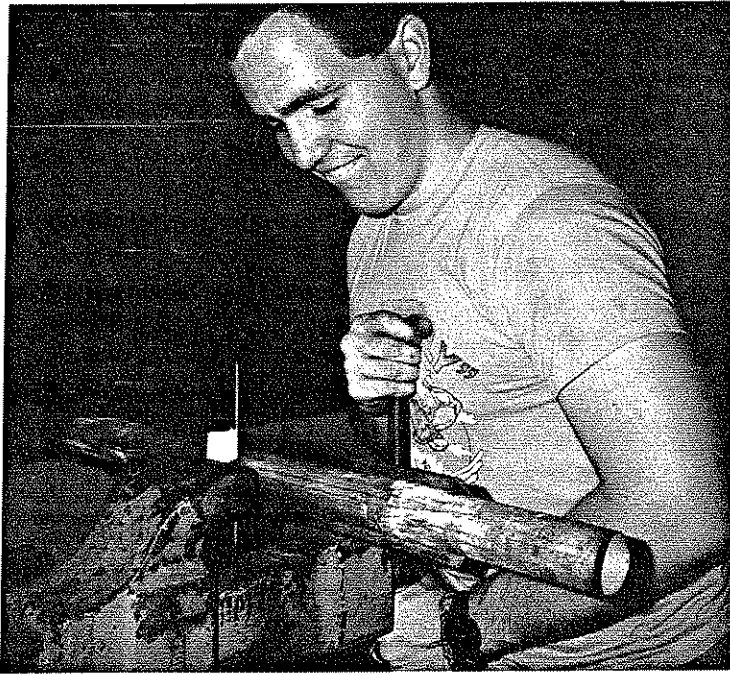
Denting of Small-Scale Tubes in Vise.
